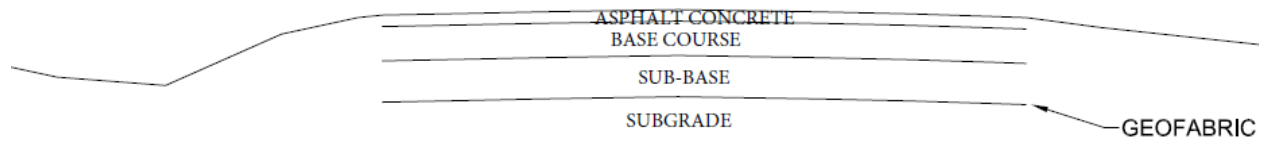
The as-built cross section of the test section FWD2. Horizontal scale is equal to vertical scale.
